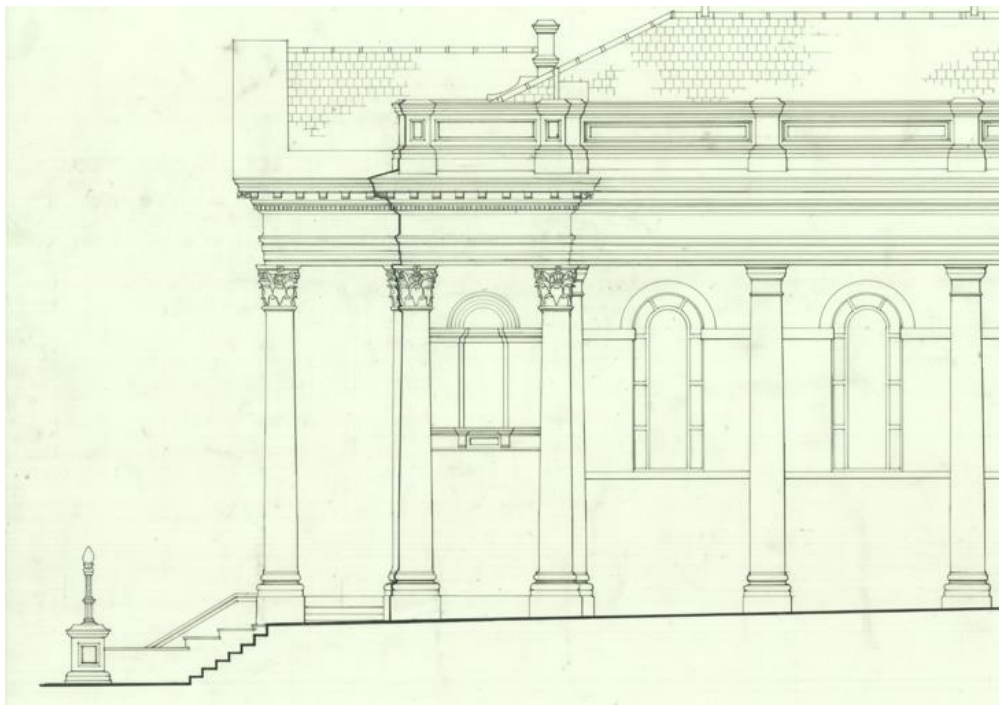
1981 drawing of the Collins Street Baptist Church showing the east elevation of the Collins Street frontage (Source: SLV ID H82.190 153)
